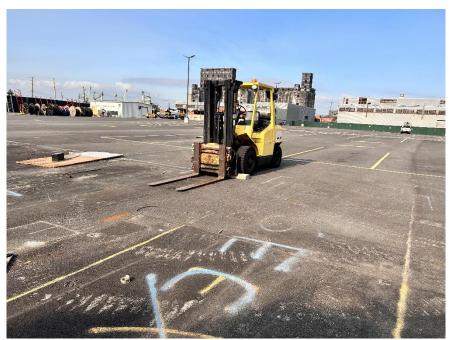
Remaining equipment from previous tenant in the eastern part of the site (facing southwest).
